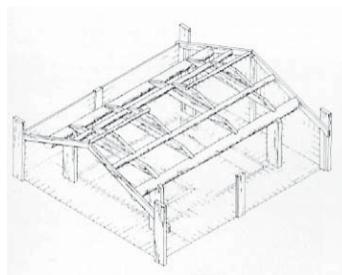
Typical Long House Frame, source: http://www.shortstreet.net/NA/naplankho.htm
